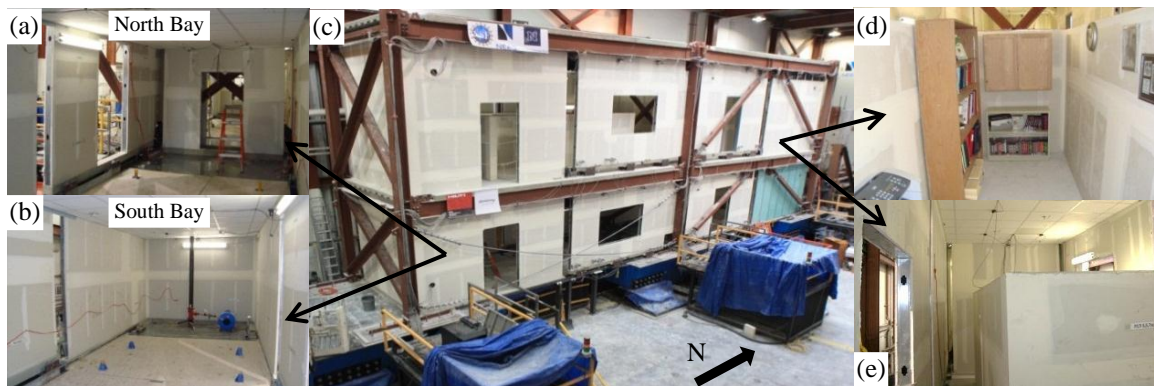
Sample Test-bed Pictures: (a-b) north and south bay rooms, (c) full structure, (d) content room, (e) free standing partition walls formulating content room
